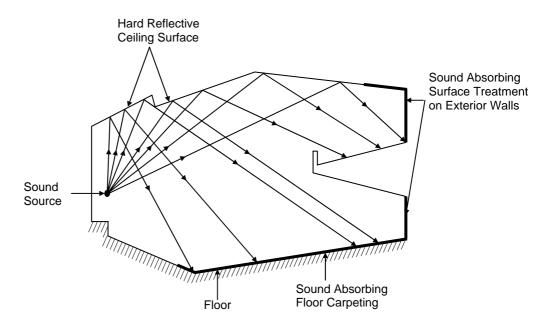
Typical Ceiling and Rear Wall Treatment
